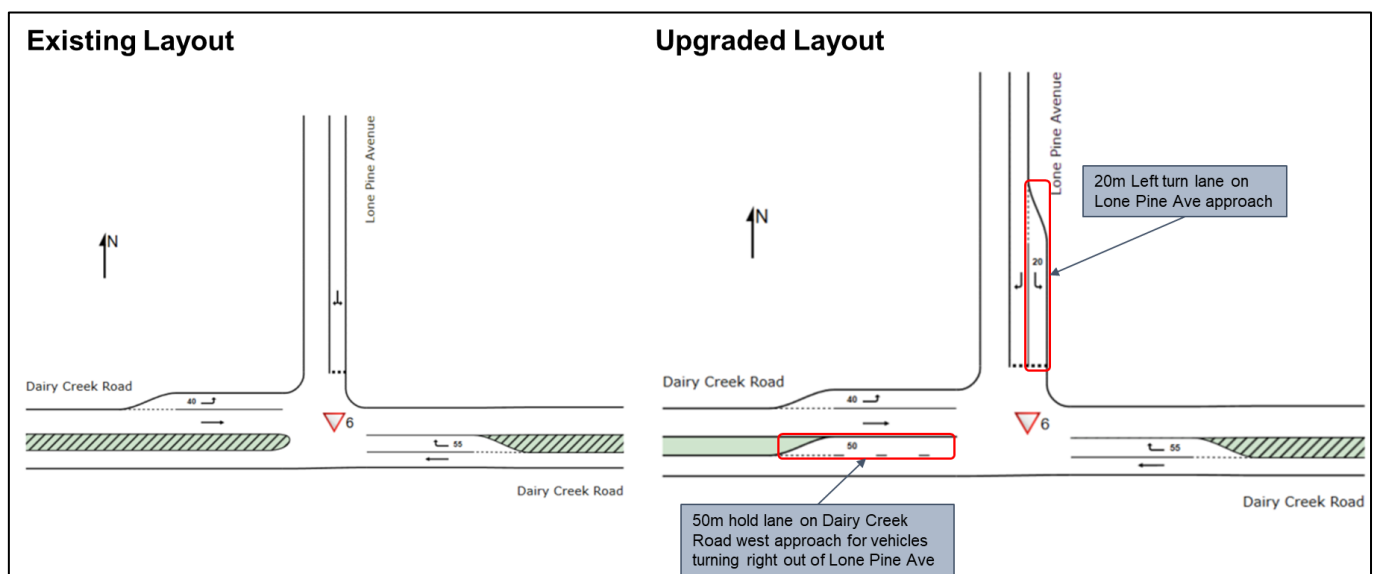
Dairy Creek Road / Lone Pine Avenue existing and upgraded layouts
